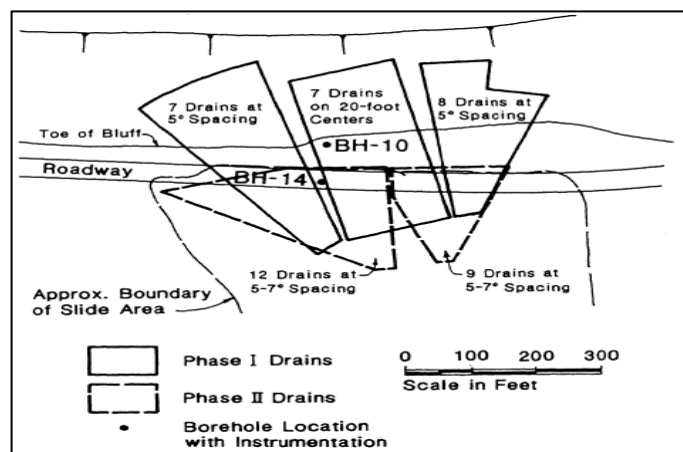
Plan view of the horizontal drains installed in the slope (Kleppe and Denby, 1984)
